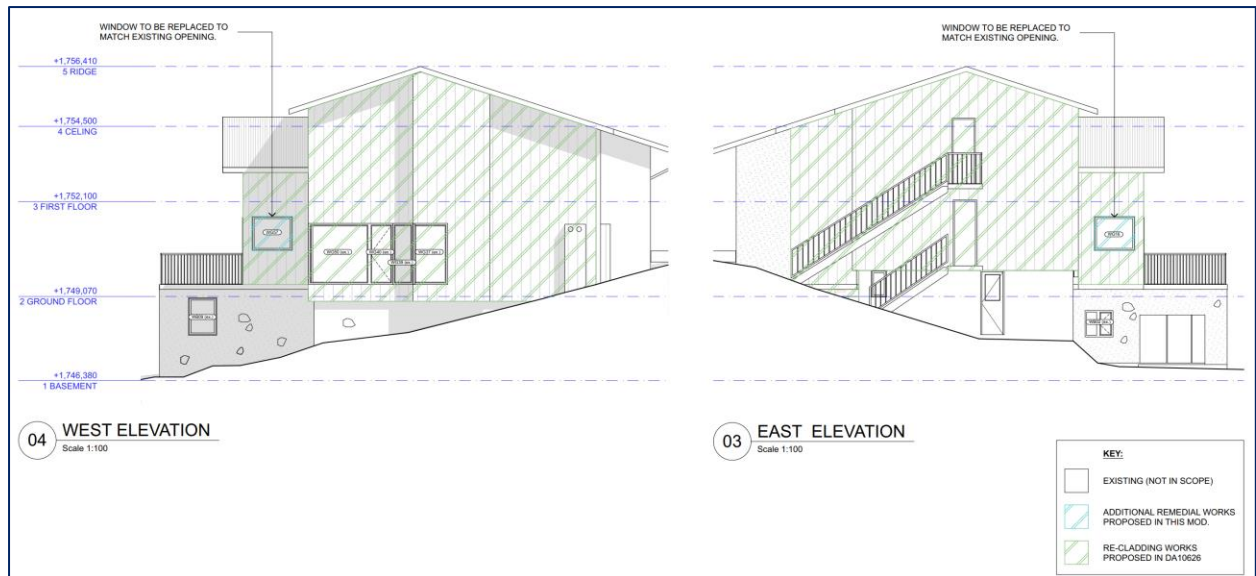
| Proposed modification to windows on west and east elevations (Source: Applicant's architectural plans 2025)
